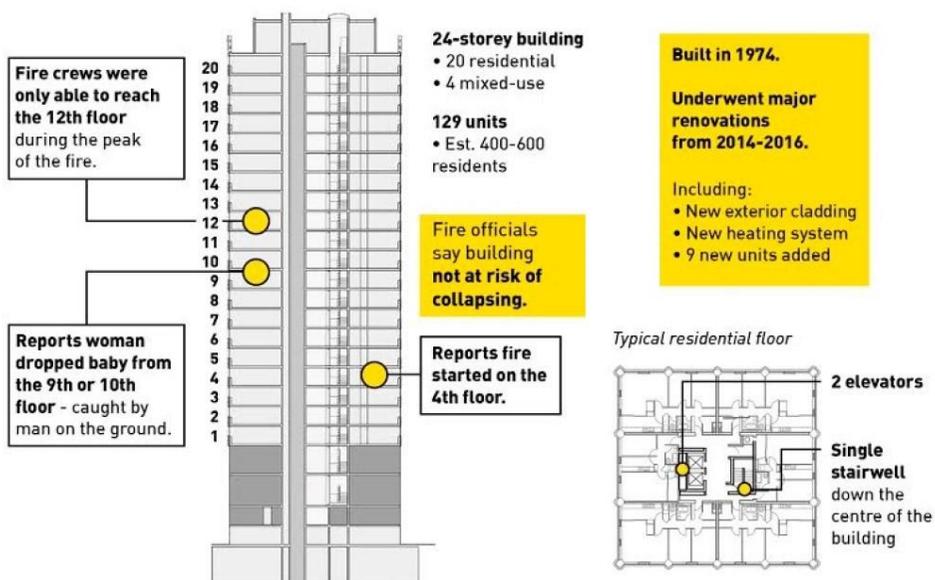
Grenfell Tower, Cross Section Pointing on Place of Fire Start, with Characteristic Floor Plan Pointing out the Only Staircases Down the Centre of the Building [74]
